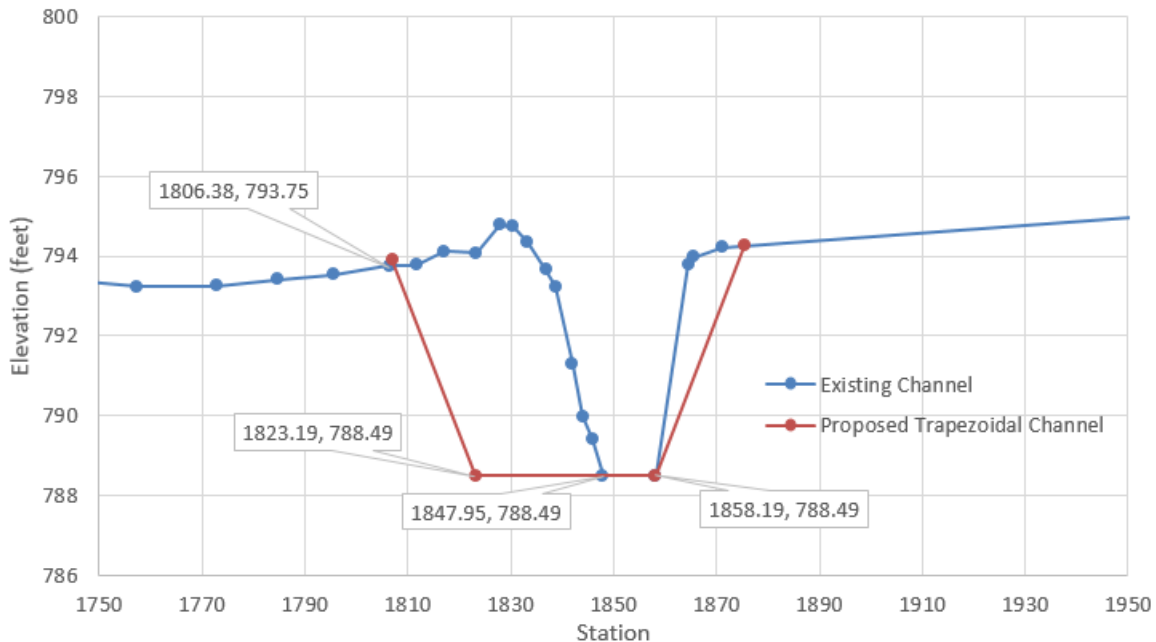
Typical Section of a Trapezoidal Channel Modification
